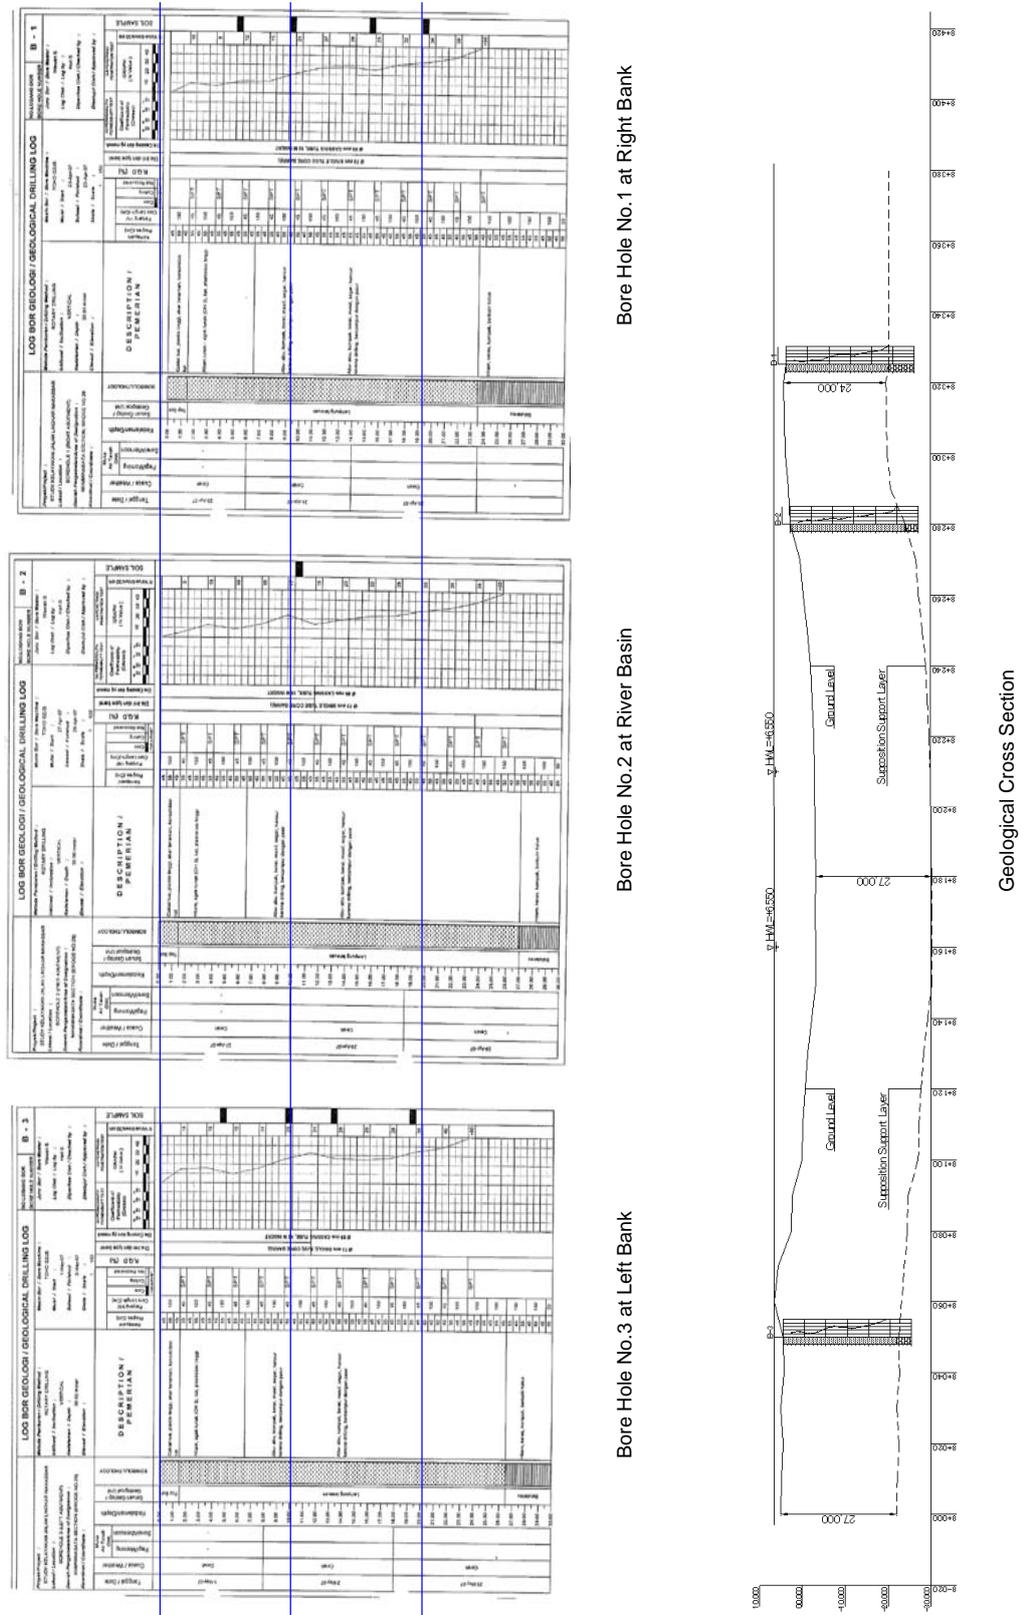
Boring Logs and Geological Cross Section for Jeneberang No.2 Bridge on Trans-Sulawesi Mamminasata Road
